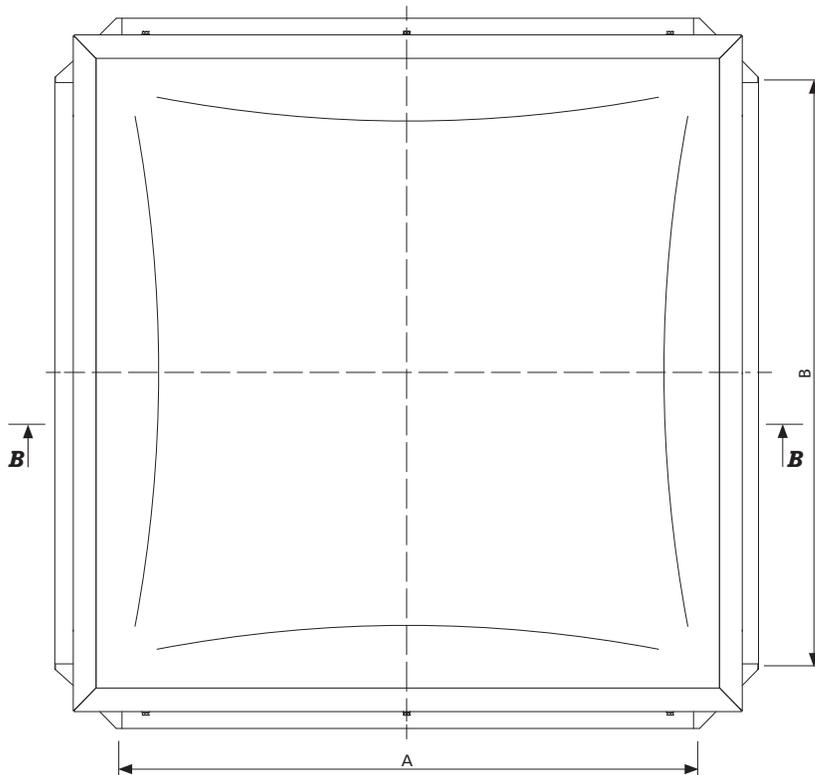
Top view of mcr PROLIGHT C or E fixed skylight, dimensions in mm
